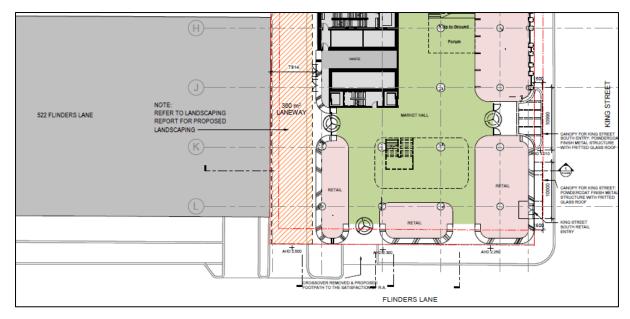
extract of the endorsed lower ground floor of planning permit PA1900572-1 at 43-61 King Street
